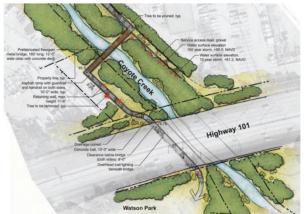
Drawing from the 2011 Coyote Creek Creek Trail Master Plan.
